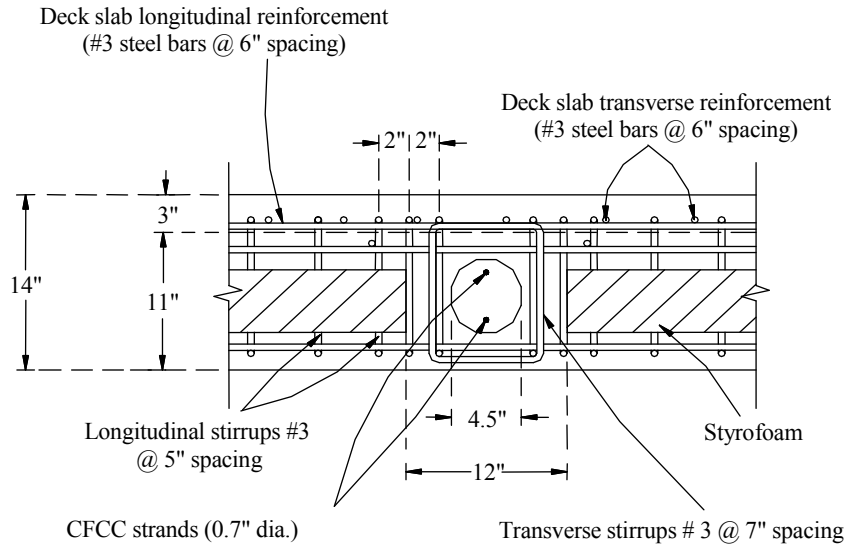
Cross-sectional details of intermediate diaphragm.
